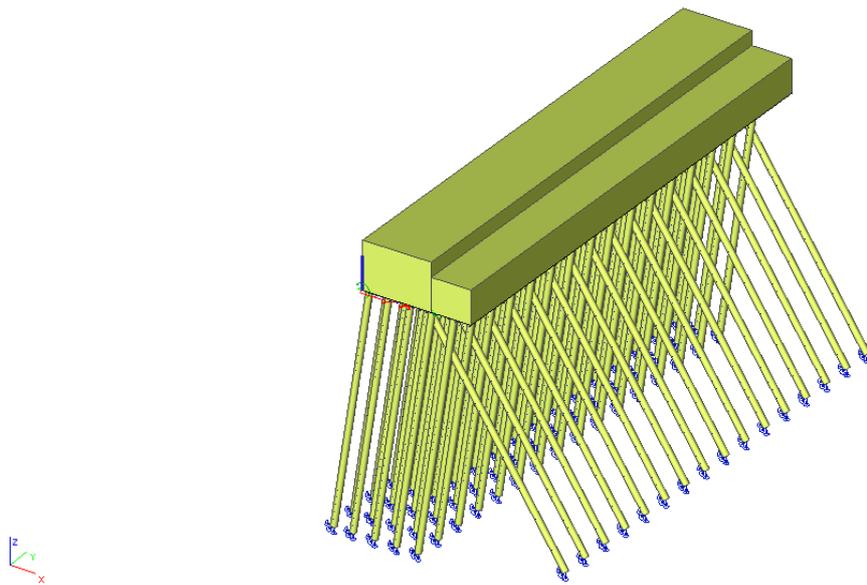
SCIA Engineer – modelling pile structure - Vergote Dock (source: Technum)
